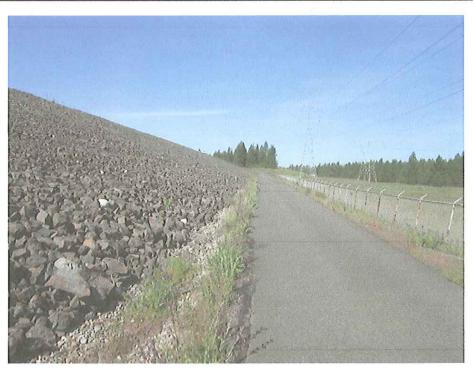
Photograph showing SPL Pile perimeter ditch along north perimeter road looking west.
